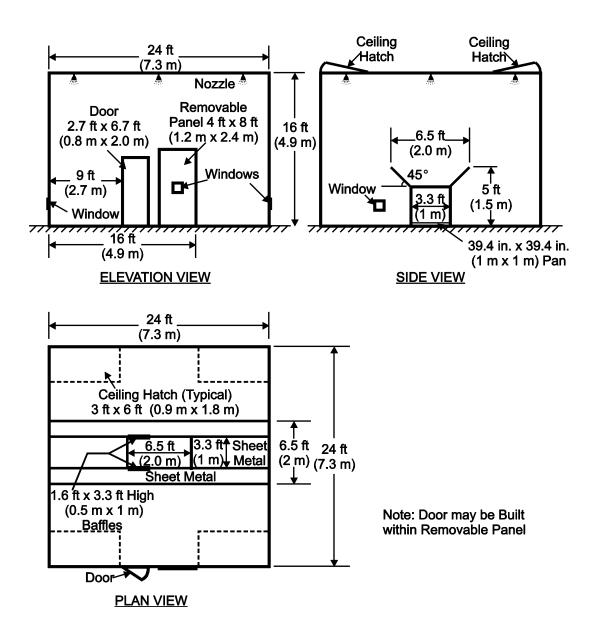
Test Enclosure and Machinery Mockup Steel Plate
